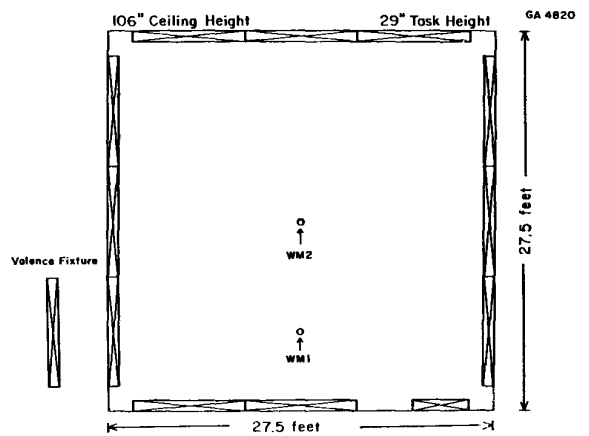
Lighting layout for valance fixture installation showing two test locations.
